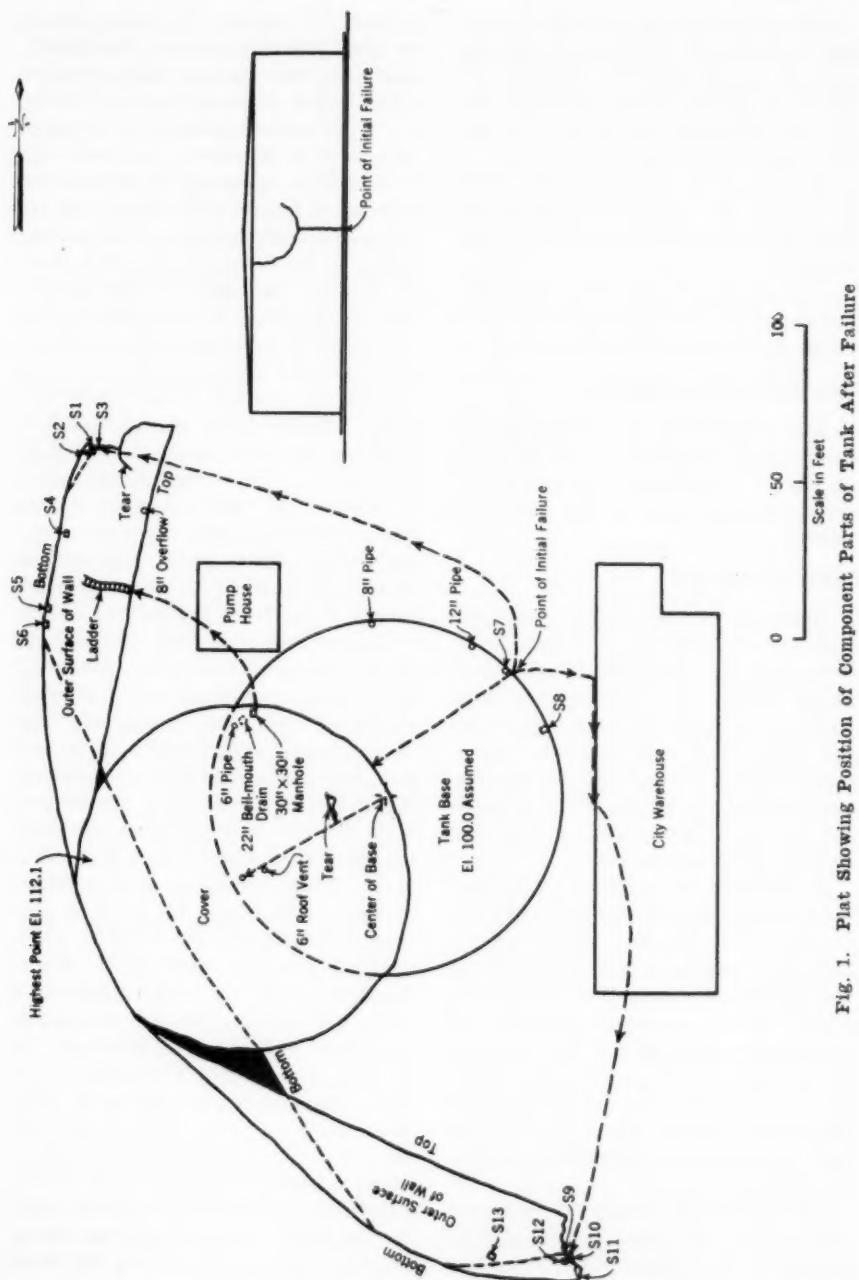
Plat Showing Position of Component Parts of Tank After Failure
